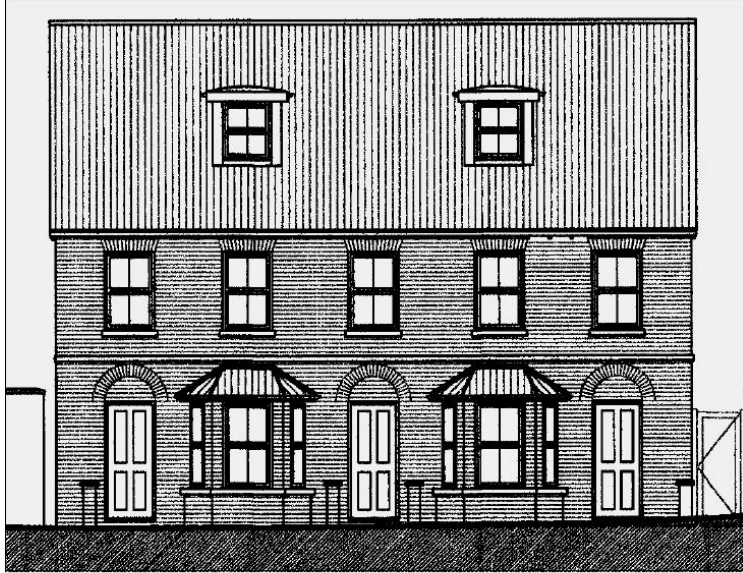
Front elevation of new building fronting Church Road as approved under permission 13/00854/EXT.
